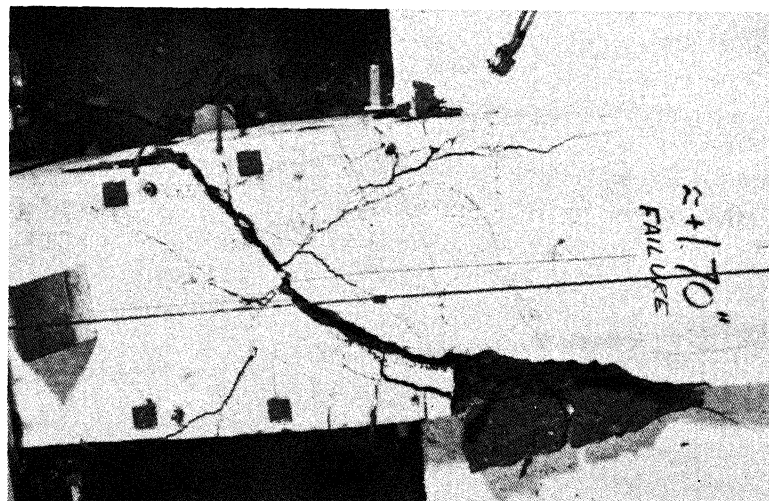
TYPICAL FAILURE OF THE COLUMN
